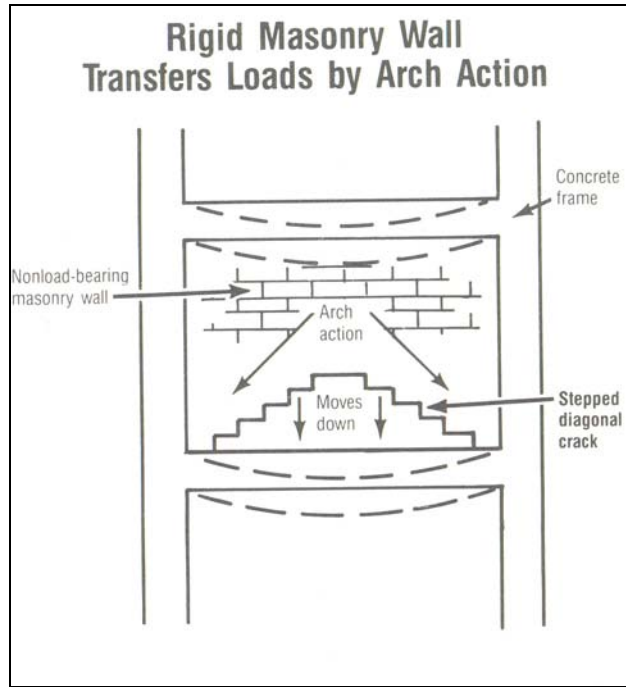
Load transfer through beam and masonry wall (*Source: Nondestructive evaluation & testing of masonry structures by Suprenant and Schuller*)
